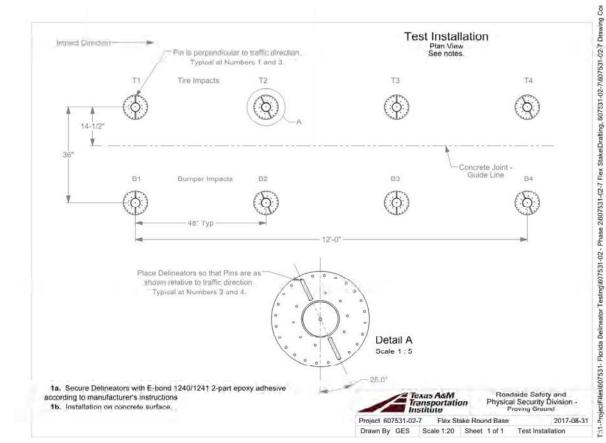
607531-02-7 Test Setup on Concrete Surface.
